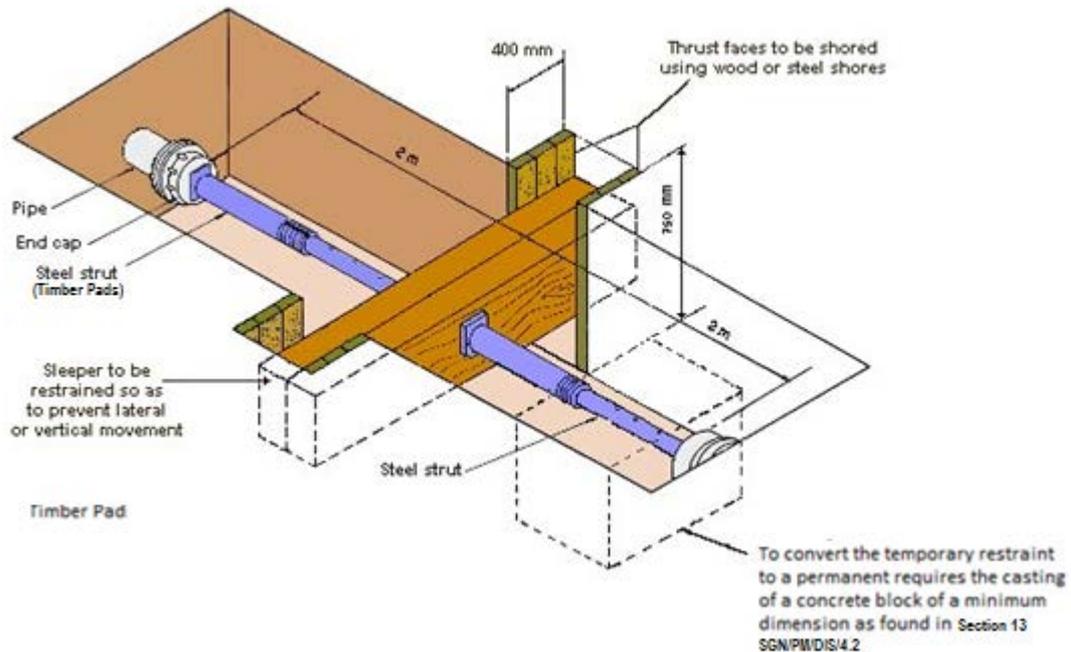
Conversion of Steels Struts from Temporary Anchorage to Permanent by Casting Concrete Block.
